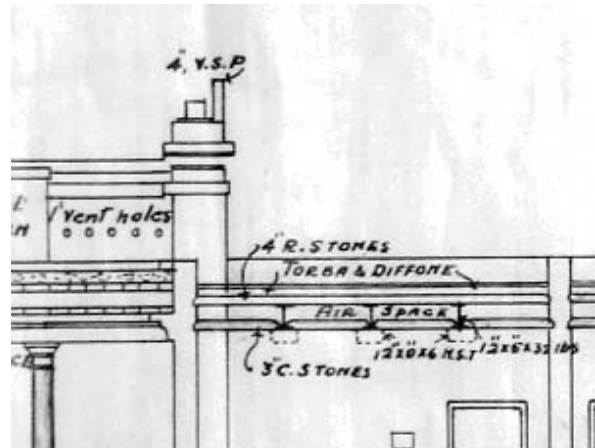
St Andrews Barracks; Detail of Roof Structure. (Malta National Archives)
